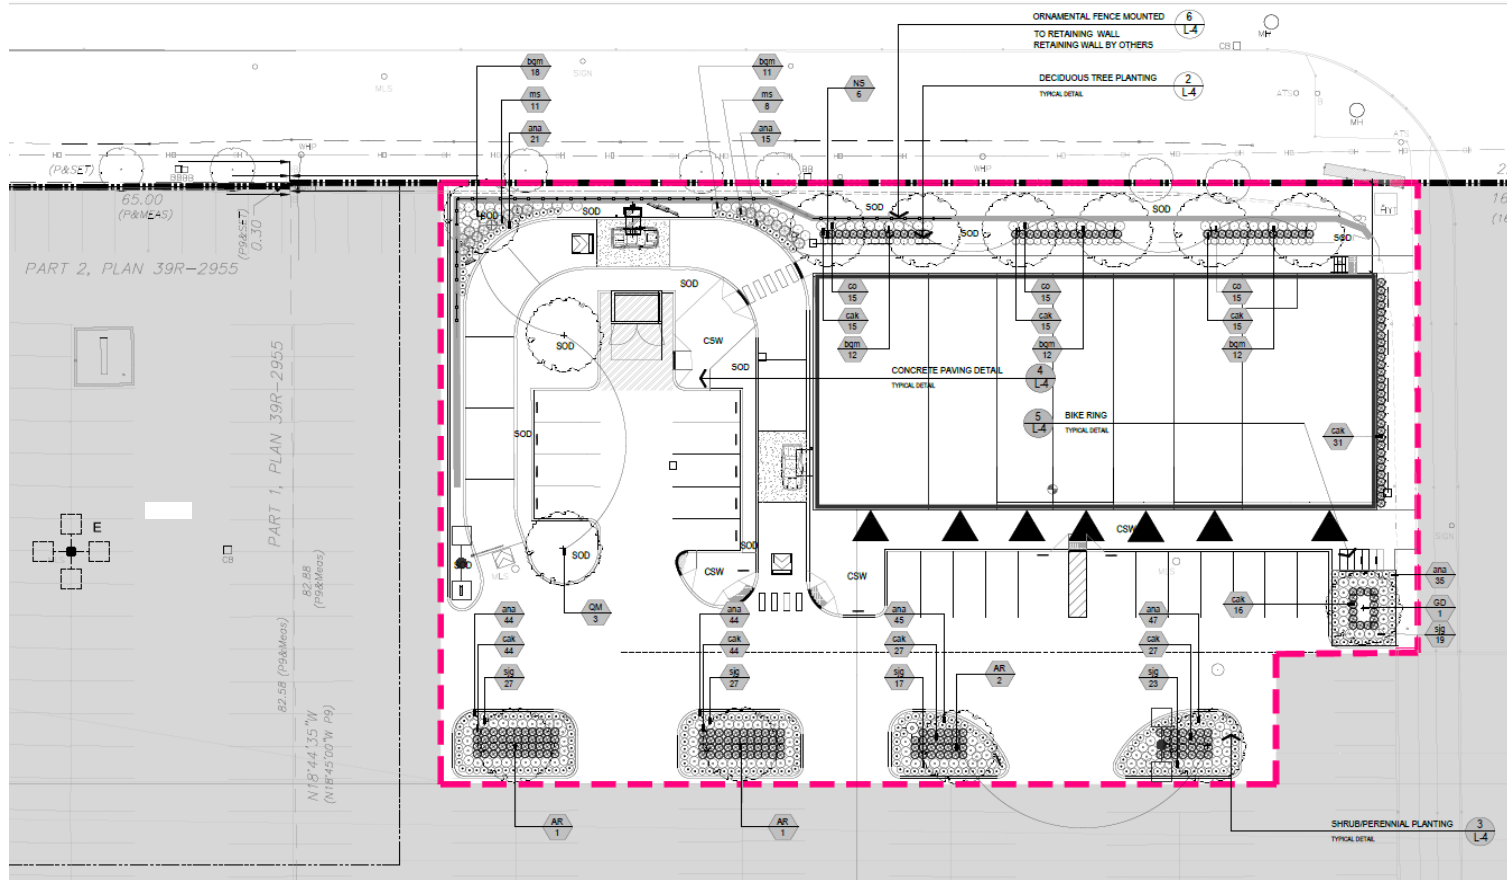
LANDSCAPE PLAN, DRIVEWAY ACCESS
